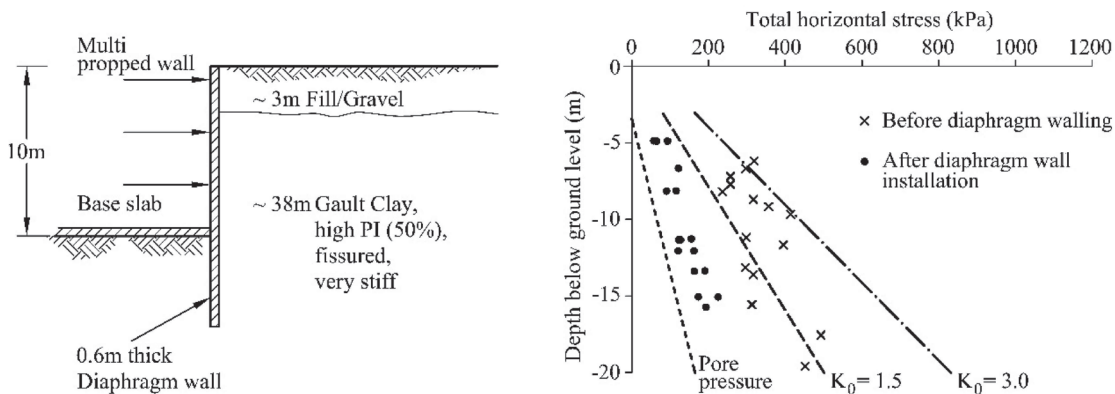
Horizontal stress, before and after wall installation, Lion Yard, Cambridge
